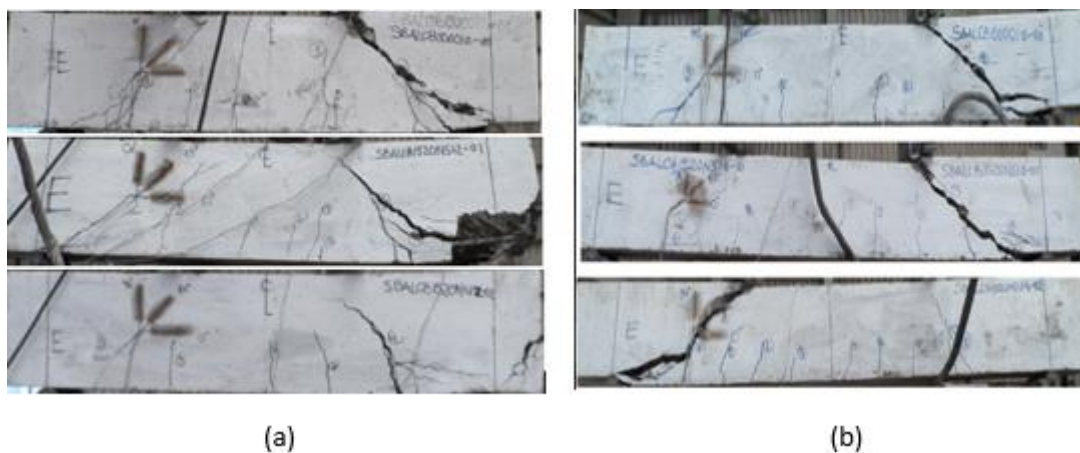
Failure pattern of (a) 1.2m and (b) 1.8m beams without shear reinforcement
